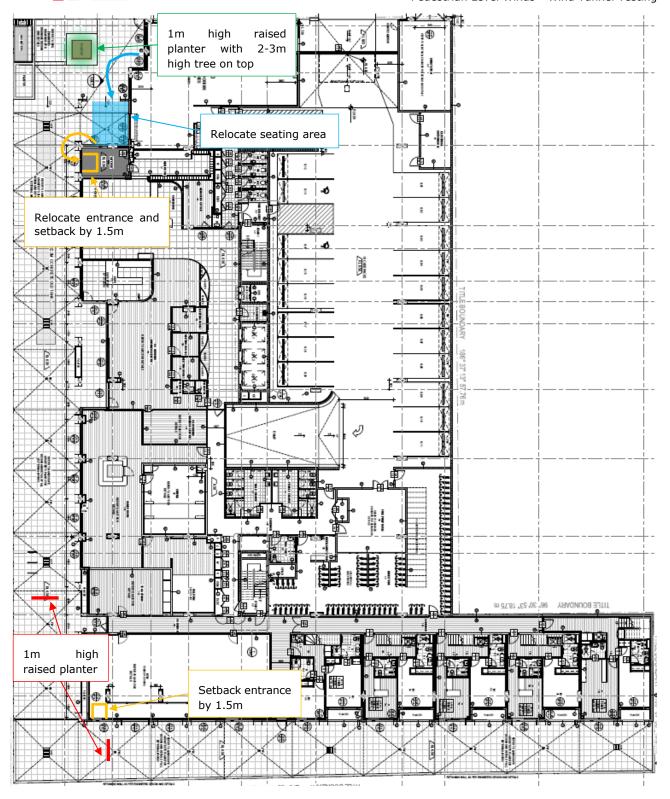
Recommended wind control measures overlaid on the ground floor plan.
